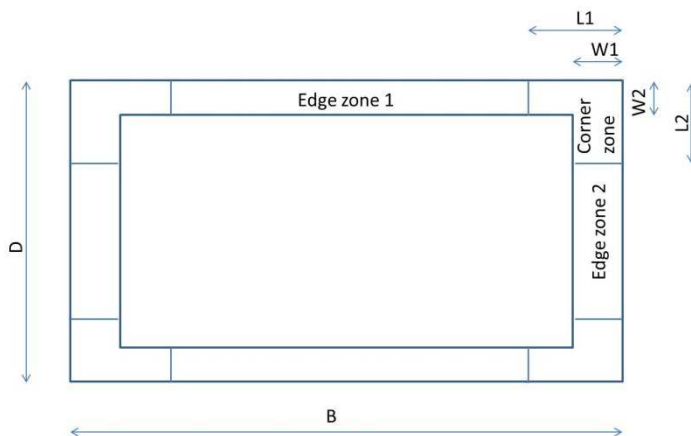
Definitions used in this paper for sizes of roof and corner zones. Note that  $B \geq D$ .
